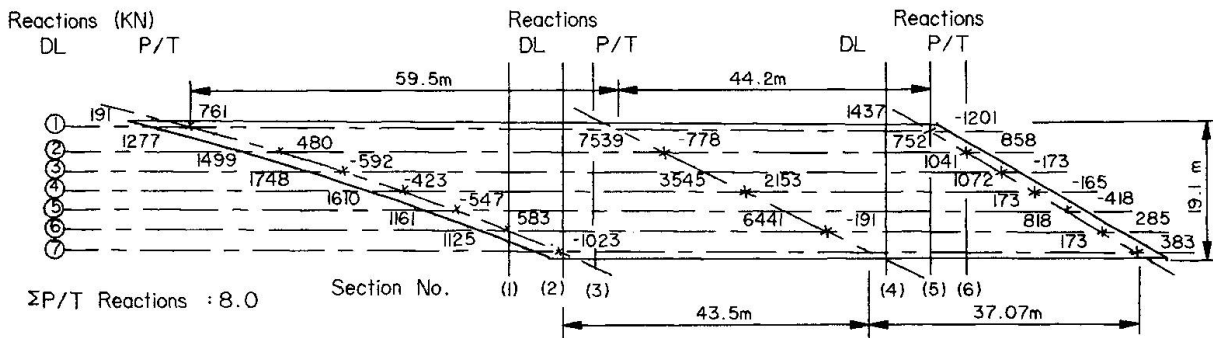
Sectional Framing Plan With Support Reactions for Euclid/Park Ave. Bridge
